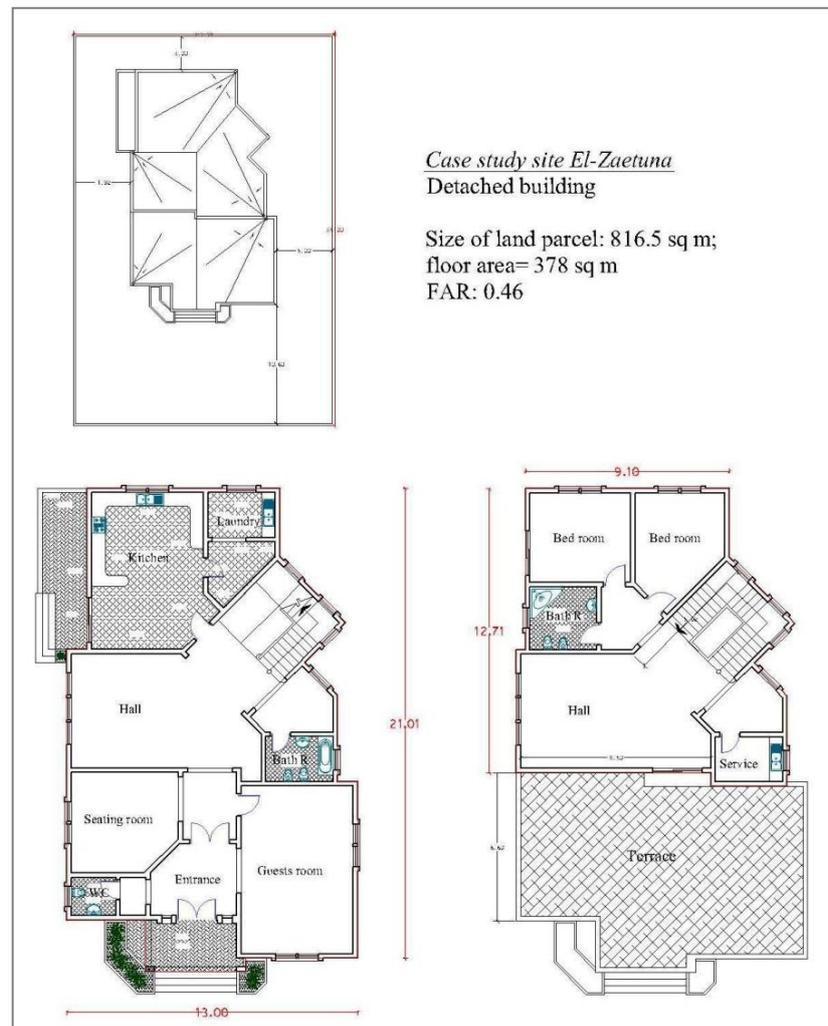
30: Architectural Plans, Site Nine - El Zaetun Area
